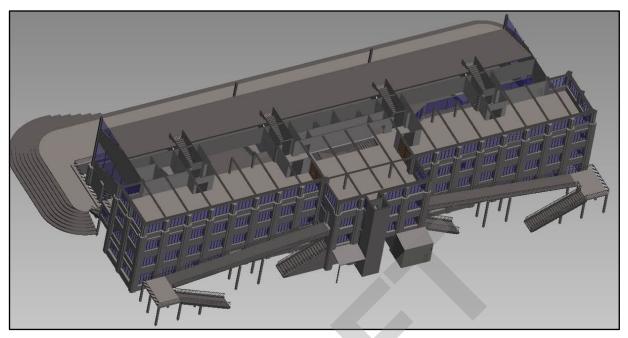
Cutaway showing beams, walls, and columns at the third floor level at GNS
